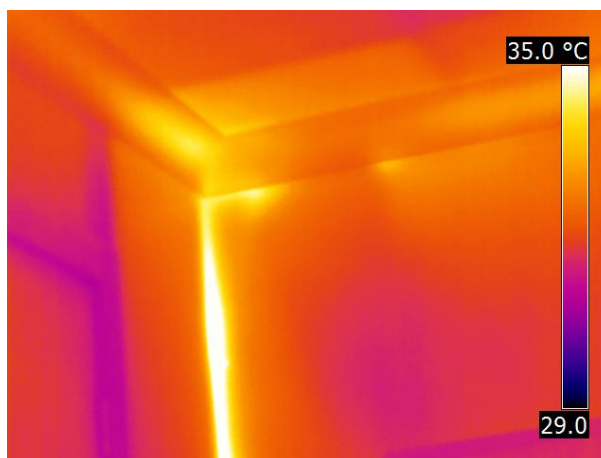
Thermal image of a wall corner facing to the east at 10 am (Source: Munsami 2018)
